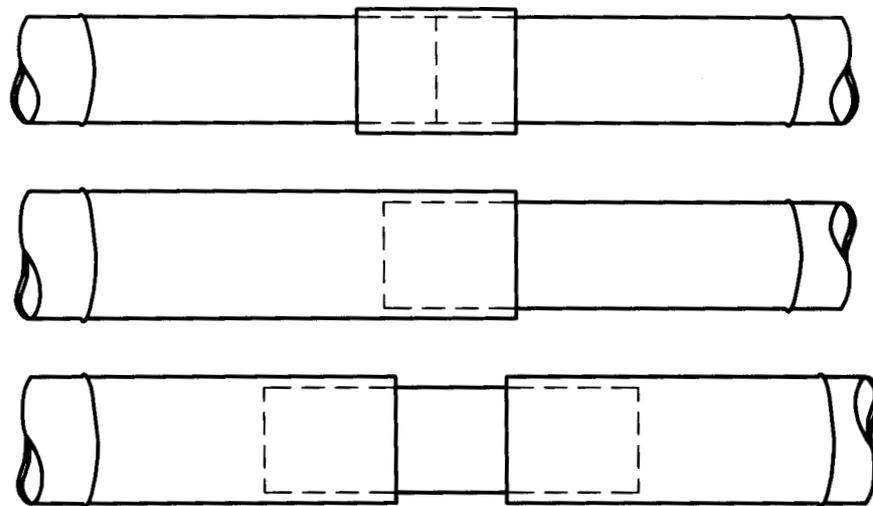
BUTT JOINT WITH SIDE PLATES IN BAMBOO
